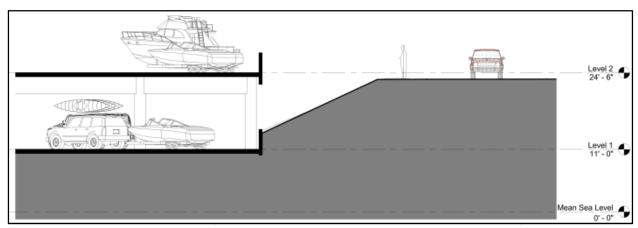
D: Section at the Dry Boat Storage Deck and Dana Point Harbor Drive
